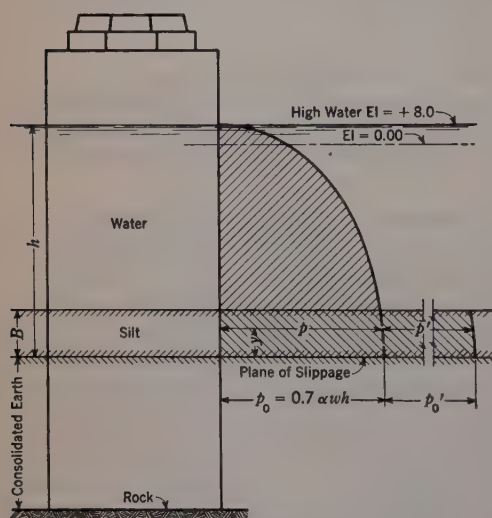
WATER AND SILT PRESSURES ACTING ON PIERS
